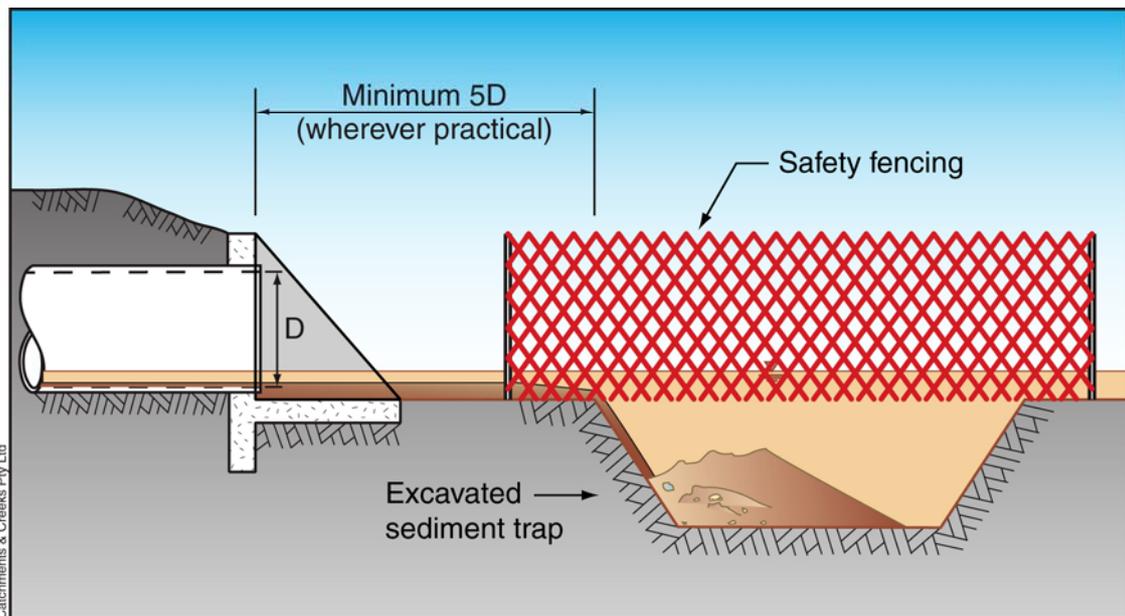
Recessed sediment trap suitable for pipe outlet with a pipe invert close to the elevation of the outlet channel
